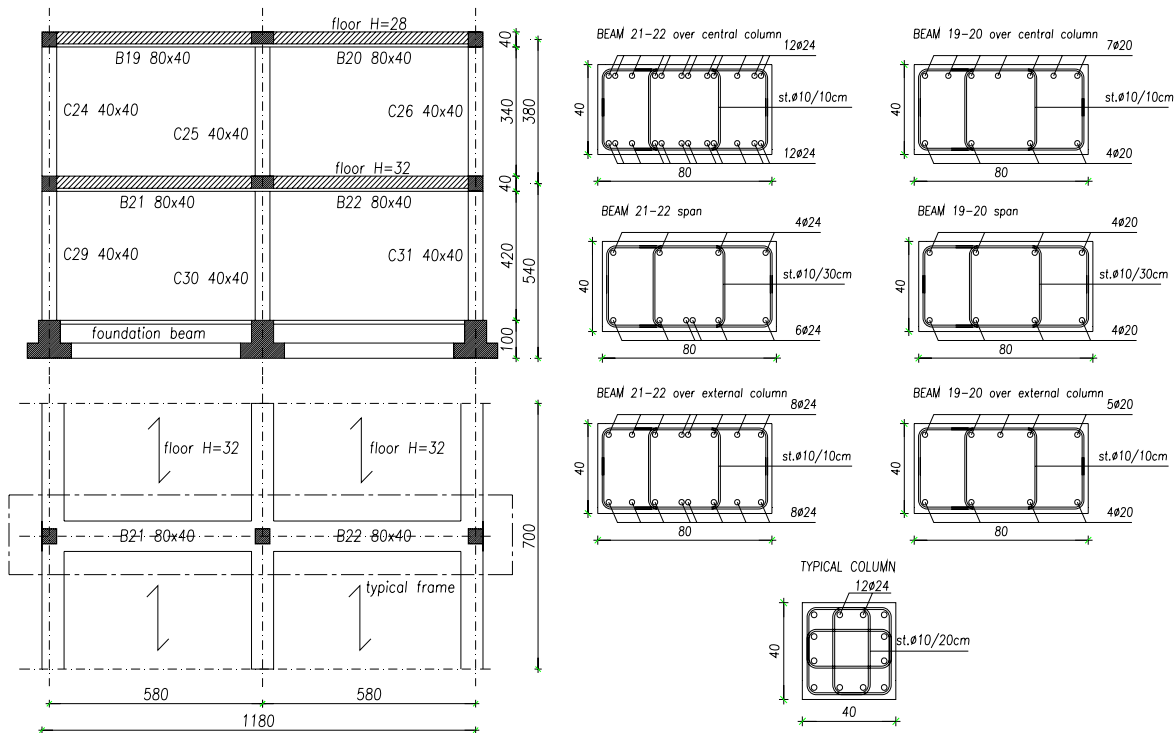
(a) Front and plan view; (b) typical sections and reinforcement details (units in cm)
